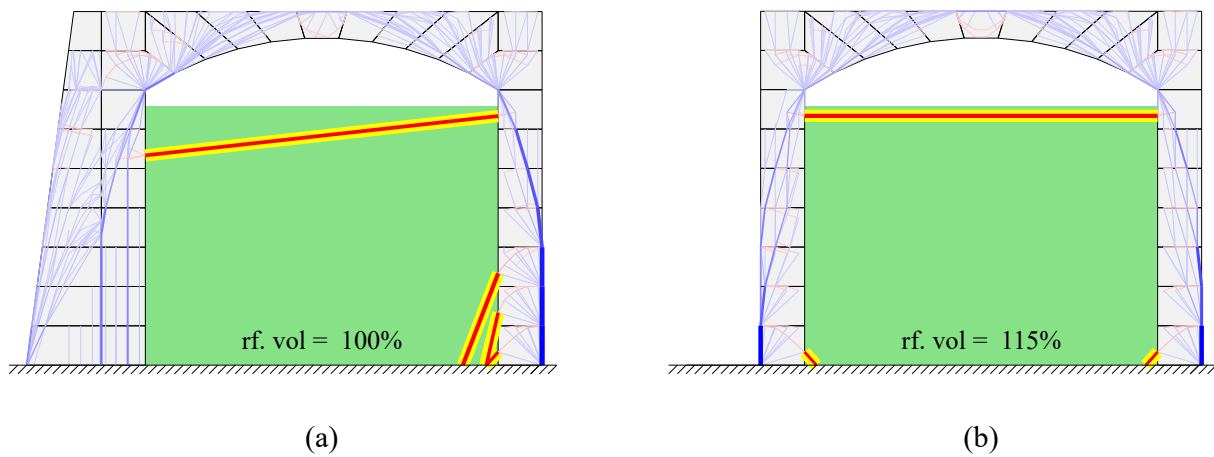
Optimal placement of ties (highlighted in yellow) to ensure stability: (a) during construction, with a buttress providing lateral stability in the final structure; (b) after construction with ties instead providing lateral stability to the final structure. The force flow within the structure is presented as a thrust layout (after [14]). Design domain shown shaded in green; red and blue lines indicate tension and compression forces, respectively.
